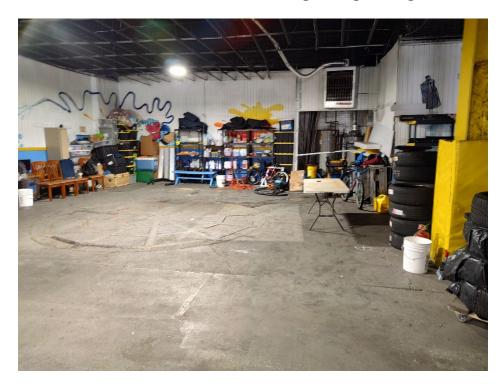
View of the rear of the building showing two additional proposed boring locations.
